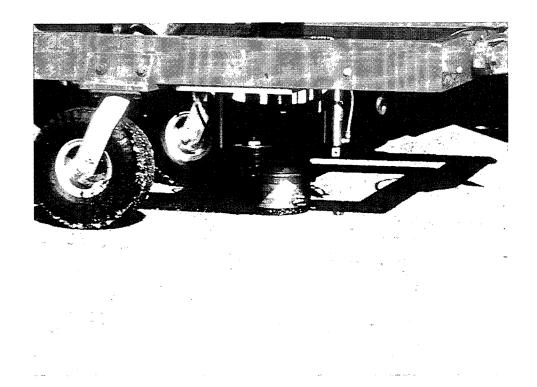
The Sealing Dispensing Unit Mounted On The Longitudinal Machine.
